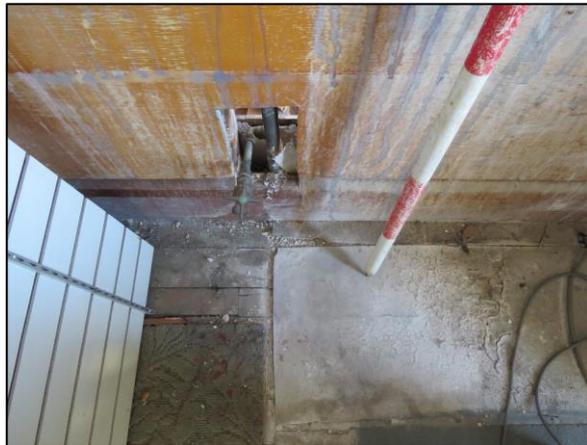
Room 39, facing down at southeast corner showing detail of wall and floor linings
